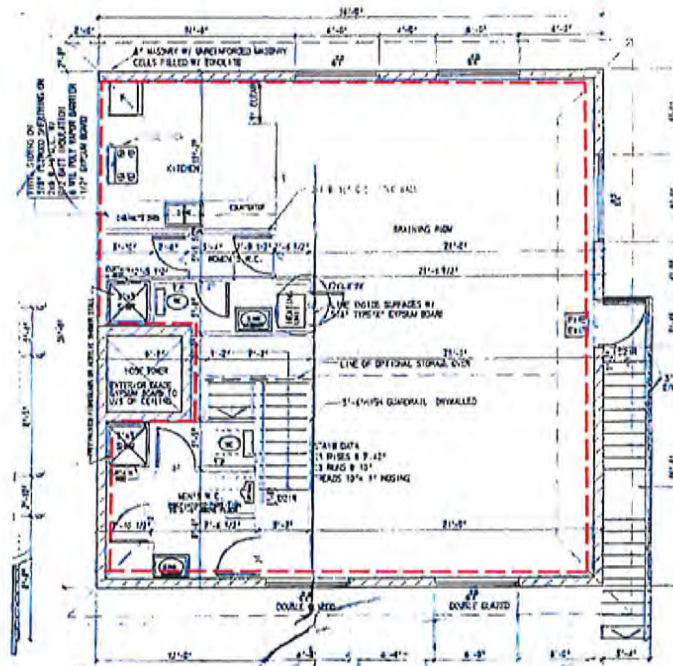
Roof Plan (2<sup>nd</sup> floor plan) (EAST)
